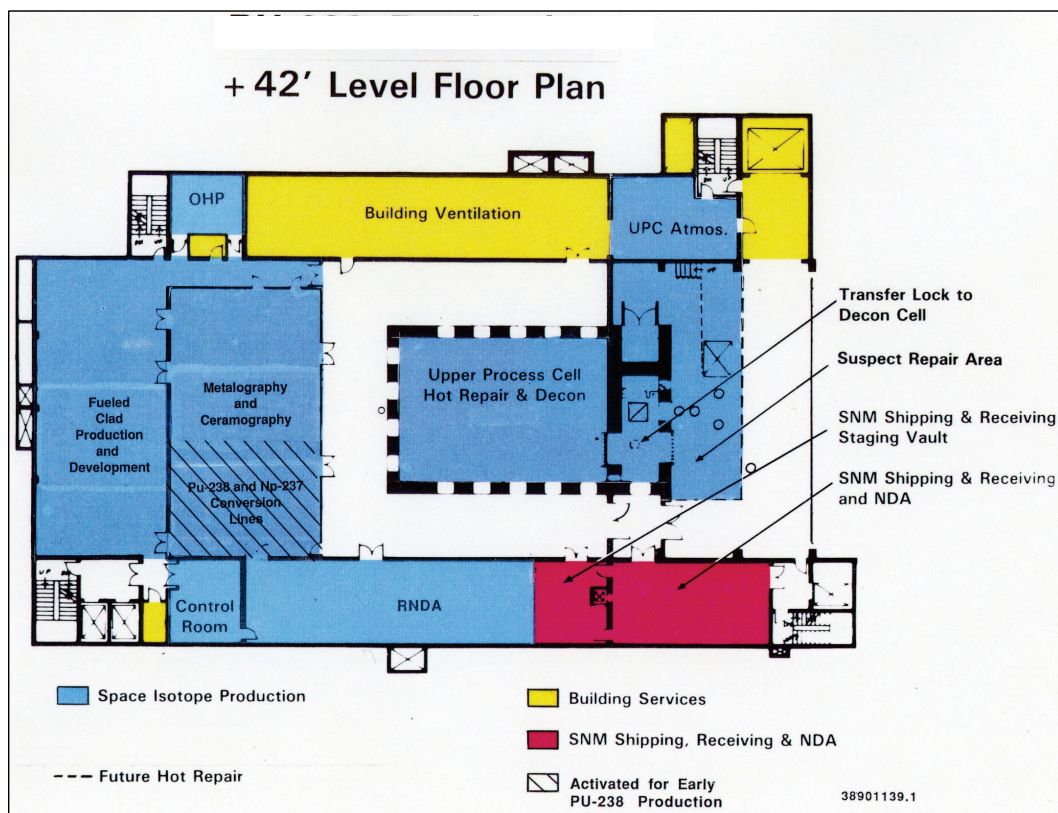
FMEF Process Building, 42 Foot Level Floor Plan. Note: Floor plan as laid out for the Radioisotope Thermal Generator Mission.
